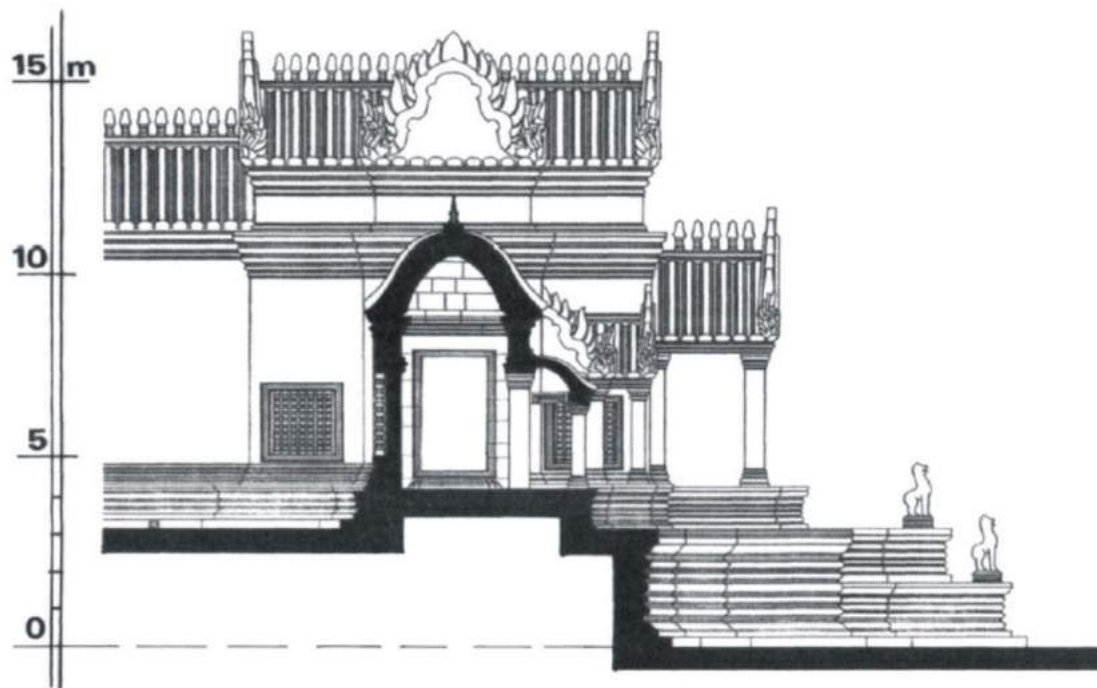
Cross section of the 3rd gallery of Angkor Wat - Note the solid wall with false balustered windows on the inside (left) and the double peri-style colonnade on the outside (right) (after Pichard 2001)
